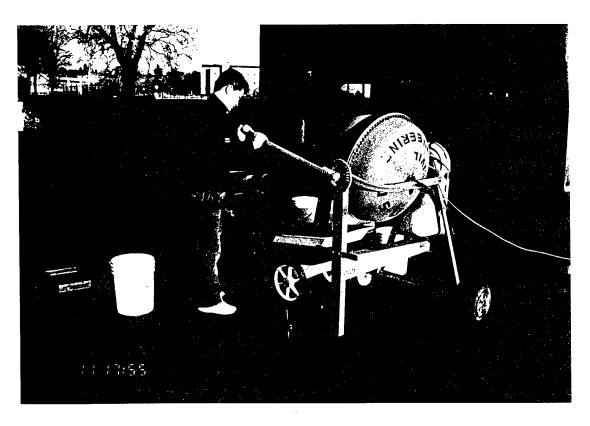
Mixing and Washing of Ballast Stone Prior to Building Model
